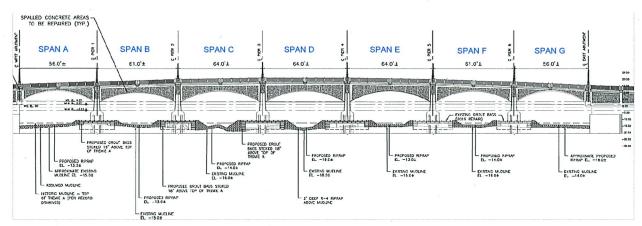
Elevation view of the Barrington Bridge, including existing and proposed conditions.
